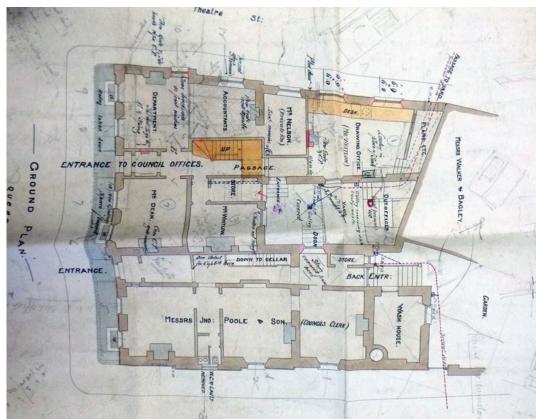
Ground floor plan of proposed council offices, dated 1902 (CAC(B) Z/1028/2 1901-1904)
